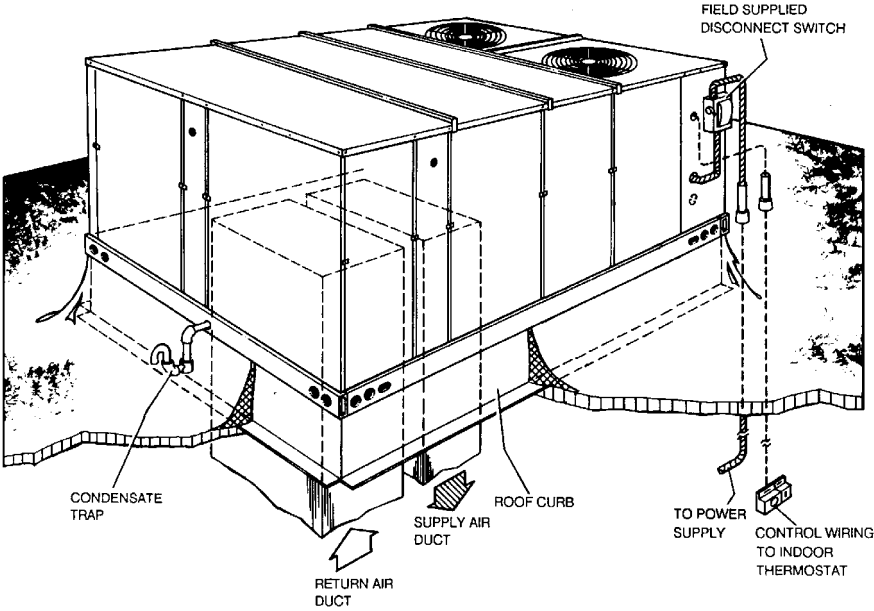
TYPICAL ROOF-TOP INSTALLATION (15 TON SHOWN)
